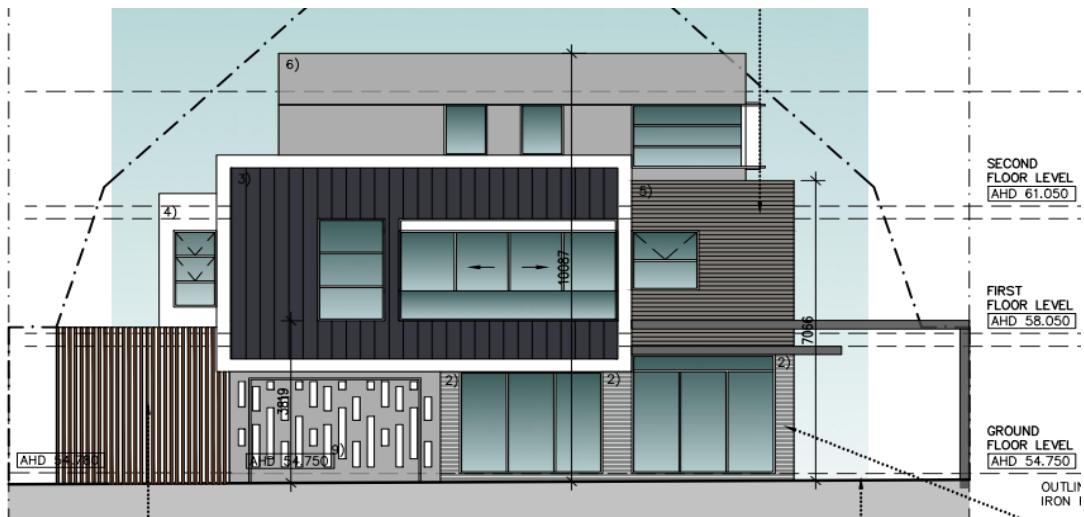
Proposed street elevation, VCAT Plans in response to Interim Order.
